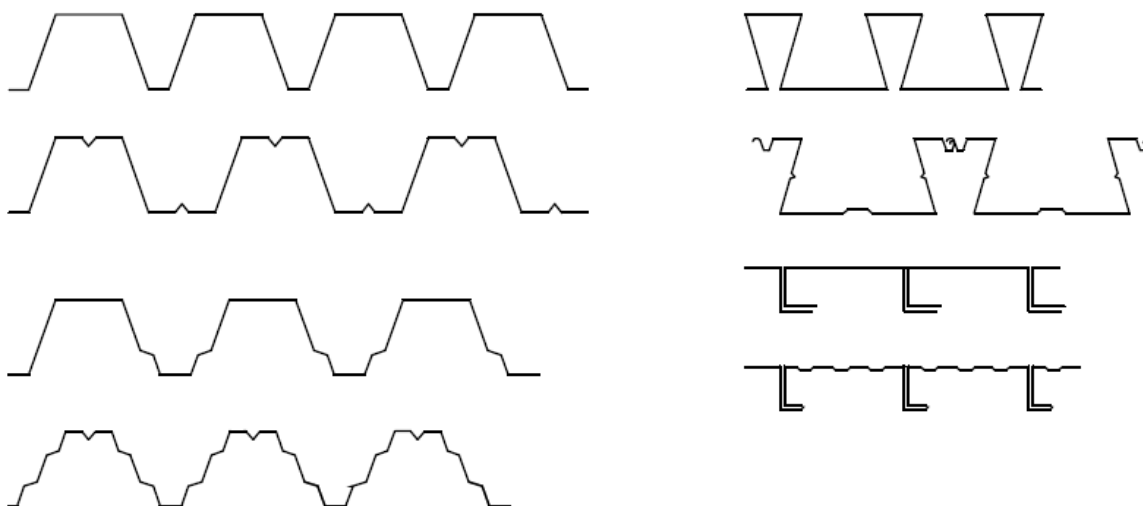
Typical Trapezoidal Steel Sheet Cross-Sections
